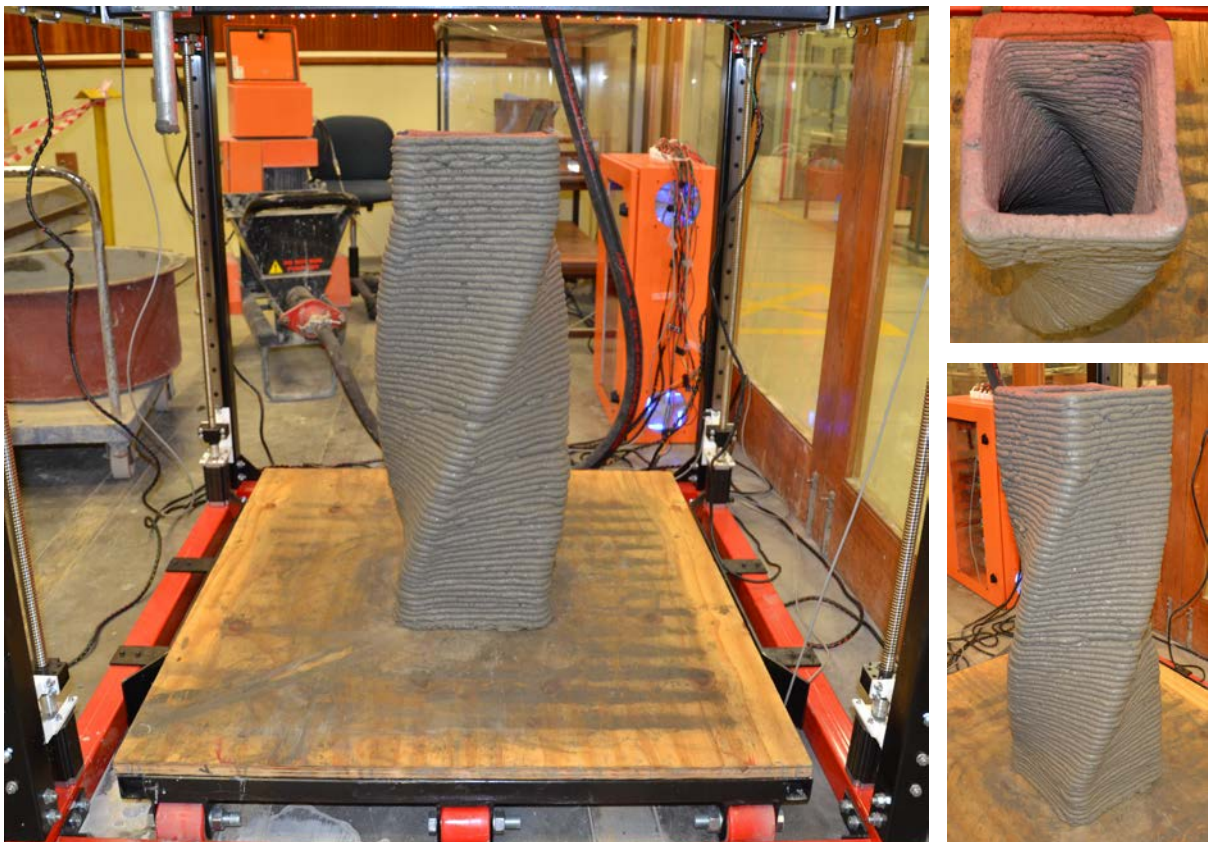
A 250 x 250 x 800 mm square hollow column that twists 90° over a height of 600 mm. The column was printed in less than 25 minutes with a polypropylene fibre reinforced 3D printable concrete.
